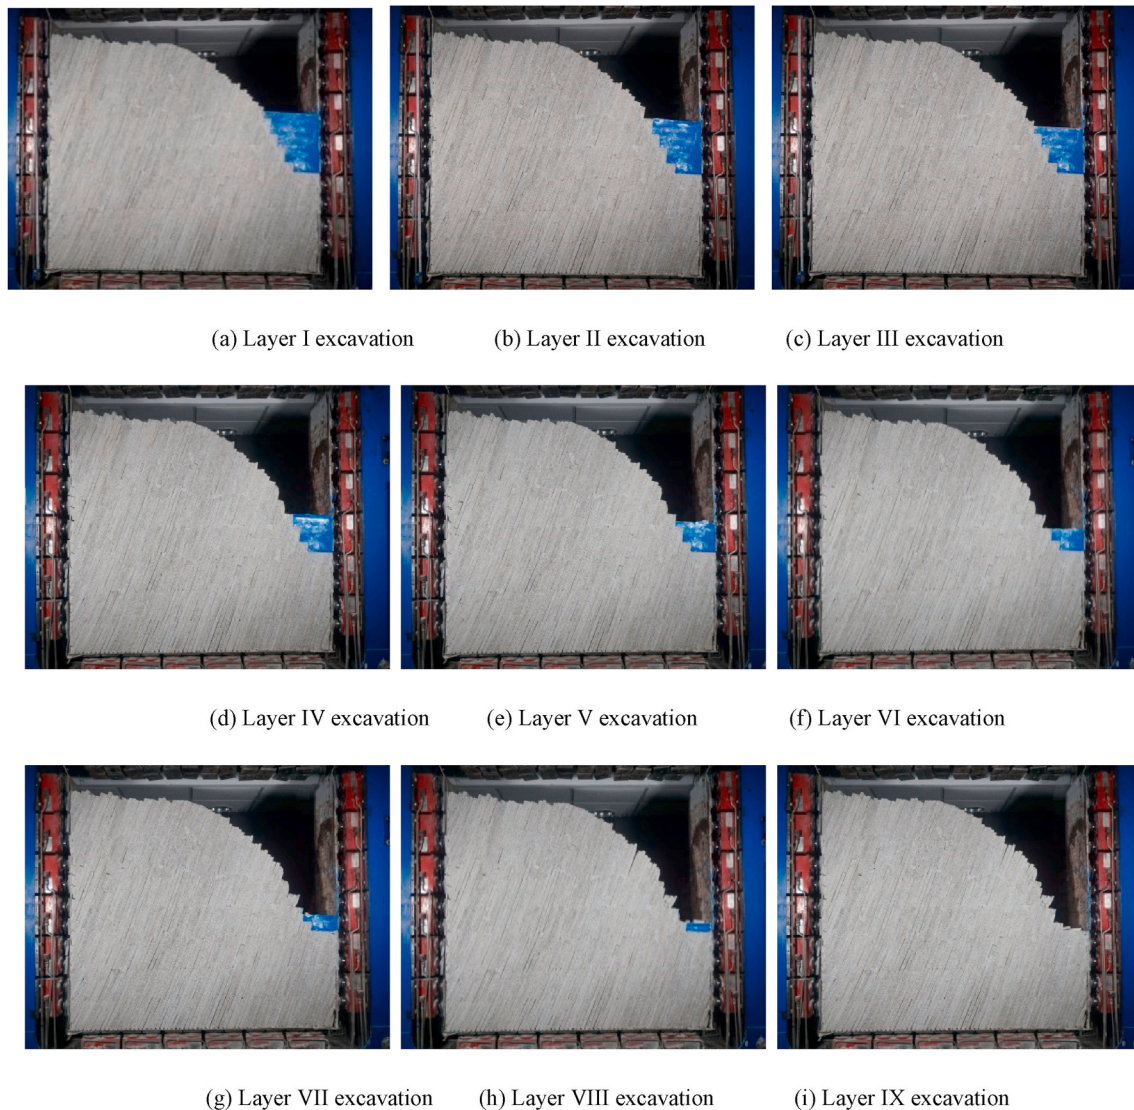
Deformation of anti-inclined slope reinforced by anchor cable under excavation.
